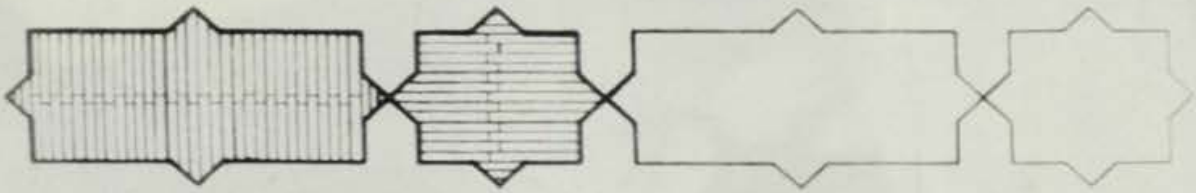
Wazir Khan Mosque, Lahore - cut and dressed flooring in geometrical pattern.
